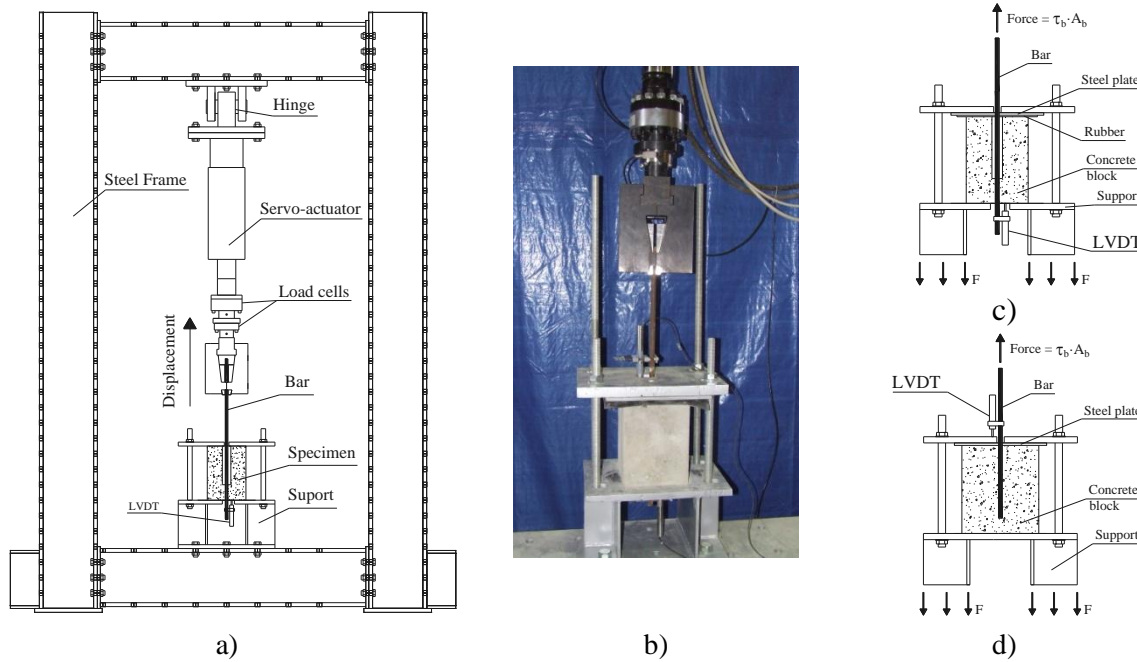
Testing setup: a) schematics; b) general view; fixing elements and monitoring details for specimens c) EN and d) WP and SP.
